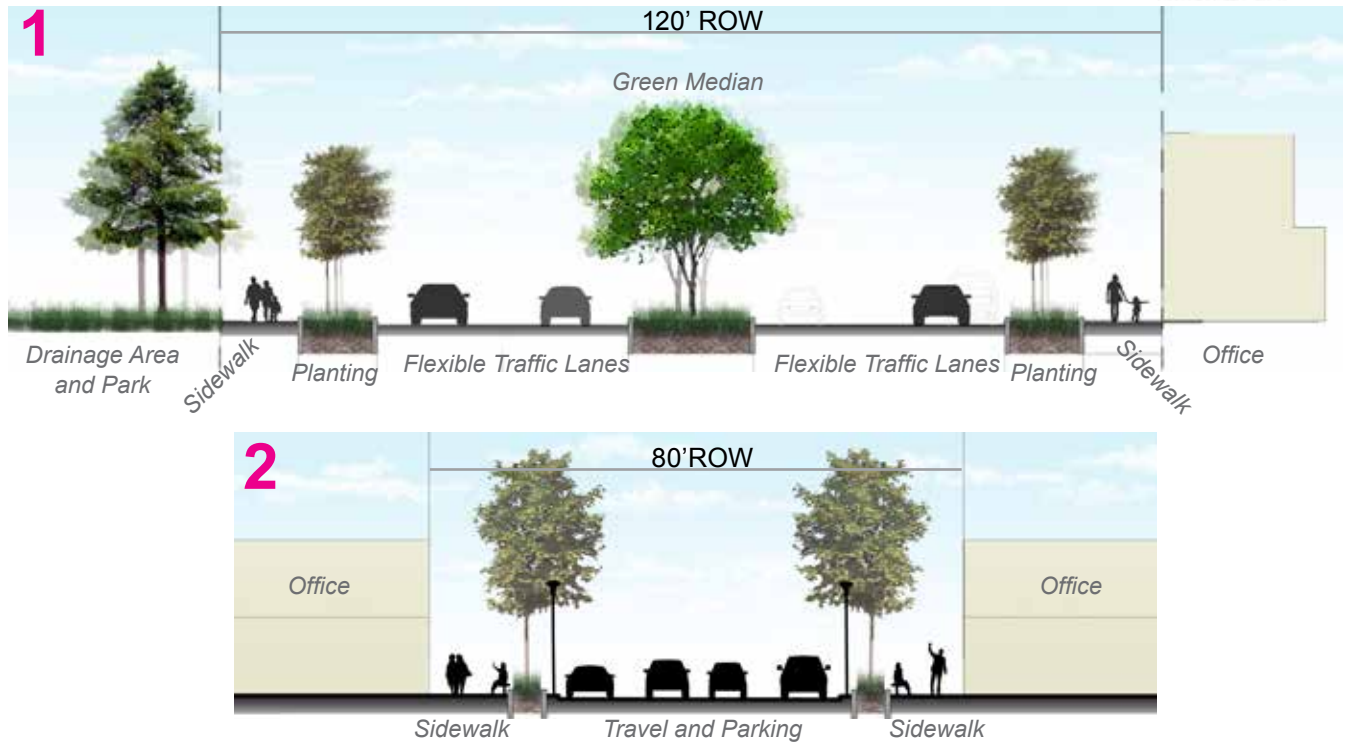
Ella Boulevard Catalyst Street Sections - In both sections, the outer travel lane/parking lane could be converted for bicycle access.
